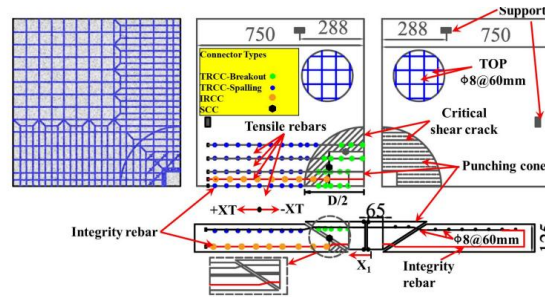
Continuous/separate model for punching shear failure in slab-shell elements before and after failure [42]
